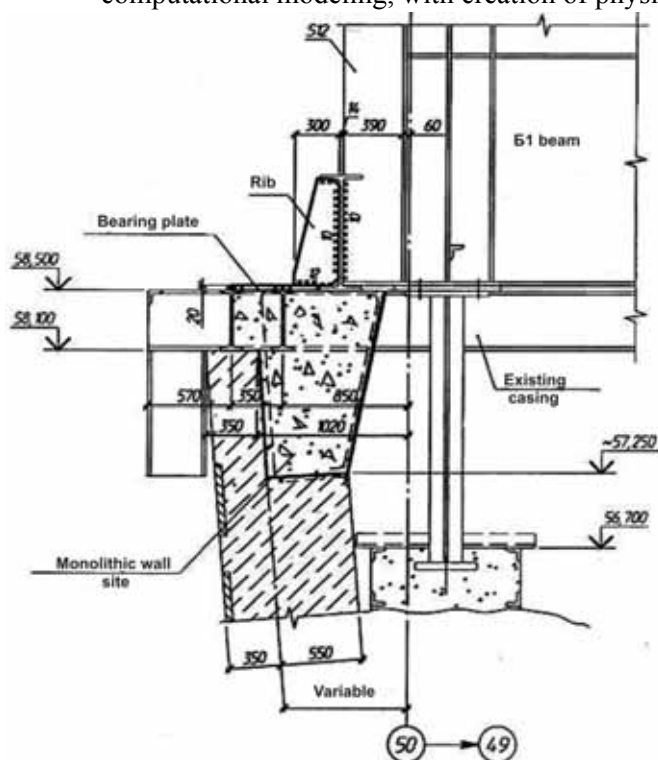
Strengthening of B1 beams supporting parts and ferroconcrete wall along axis 50 in place of resting upon it of B1 beams unit (row Ж)
